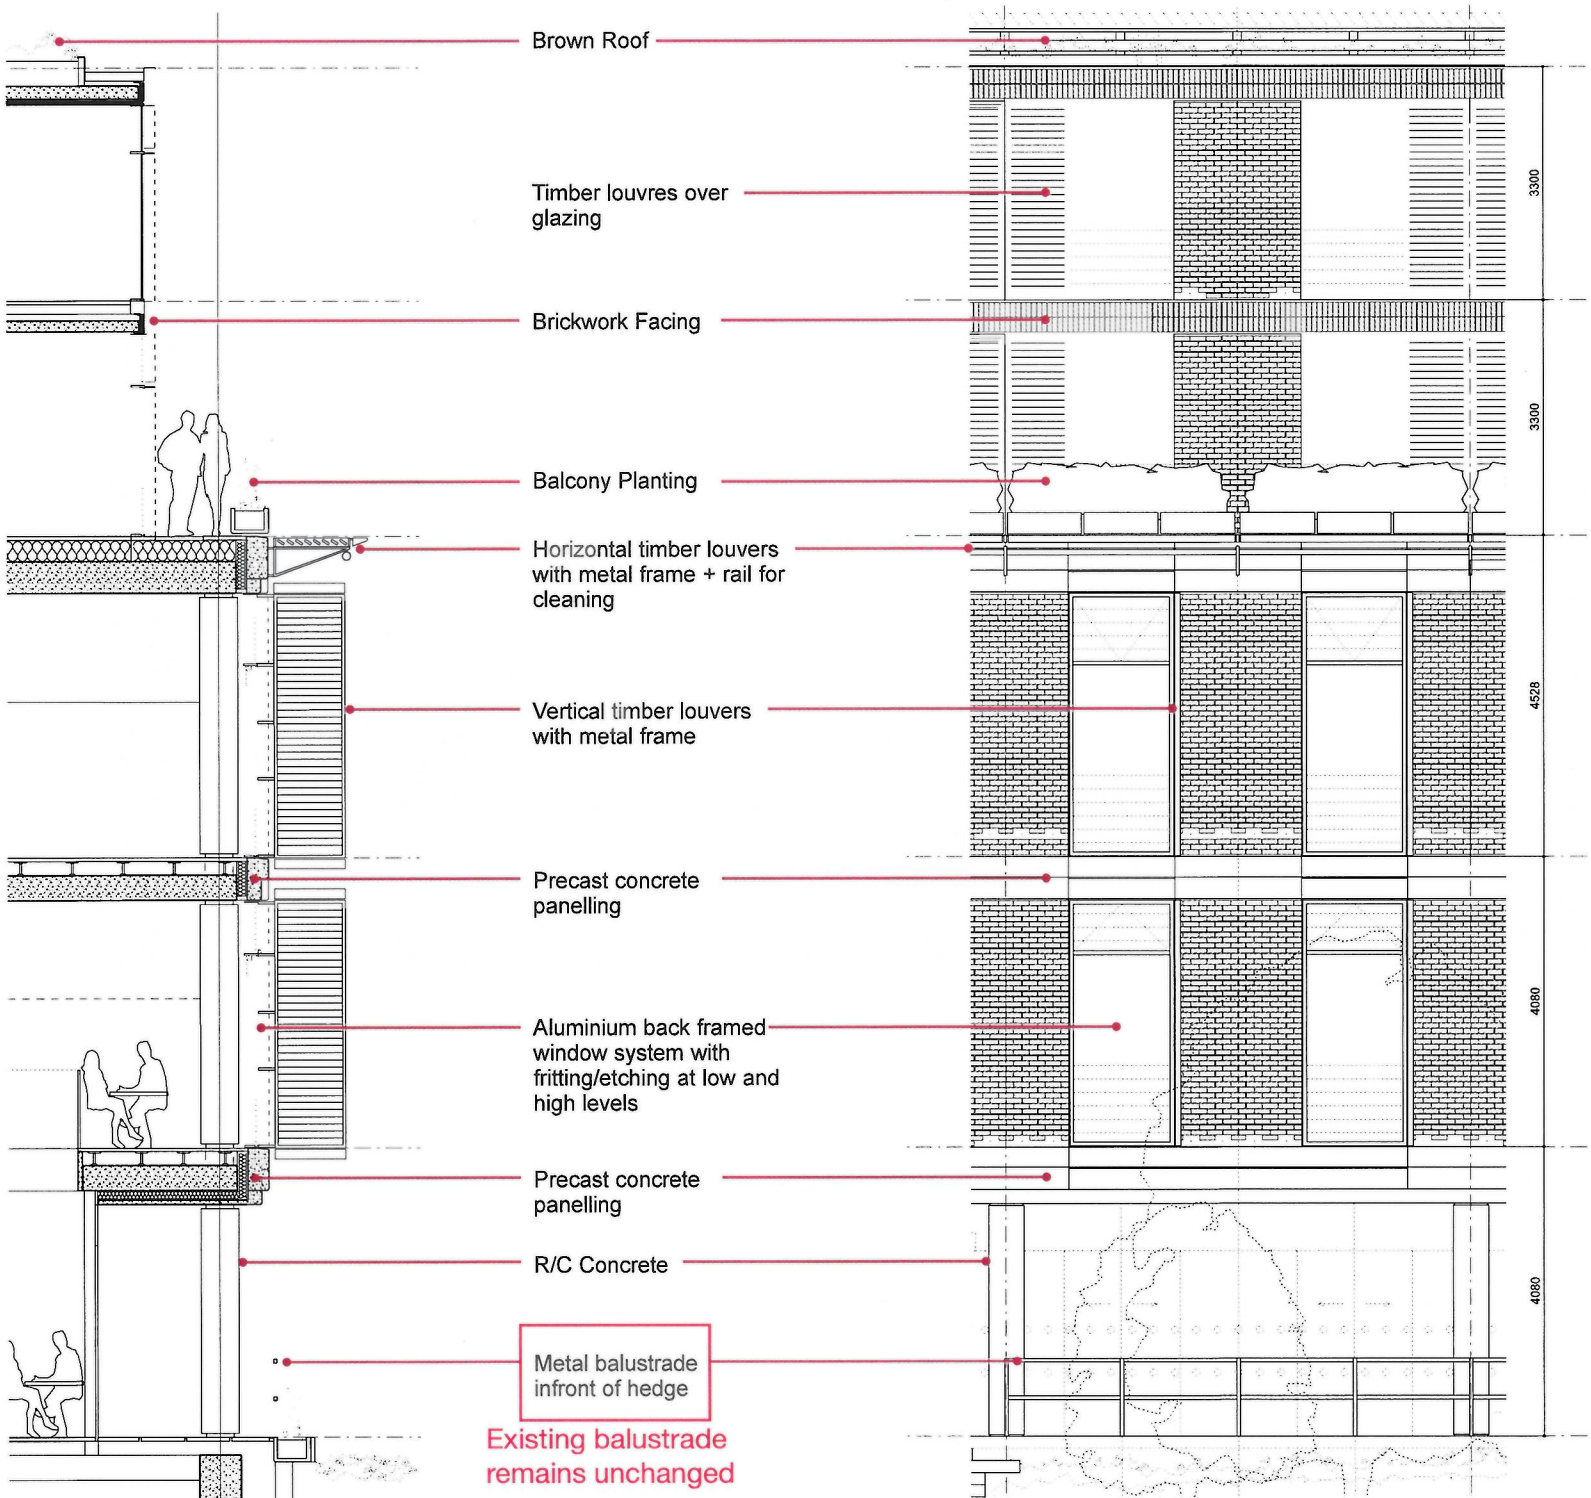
Extract of Section 5.8 of the originally submitted Design and Access Statement - Elevations and Materials
